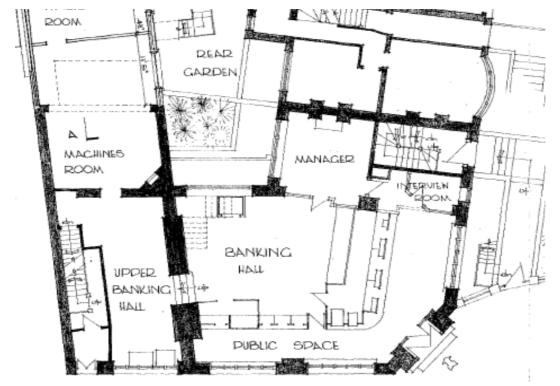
1979 Proposed ground floor plan, Planning Ref. HB2259
